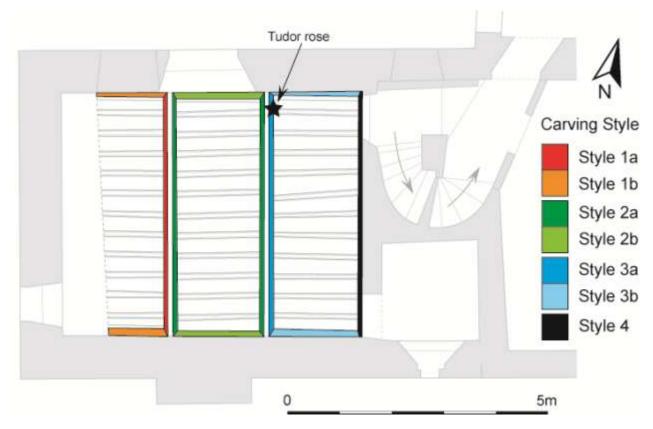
Diagram of the carved beams and joists, projected against the first-floor plan and showing the layout of the various different Styles.
